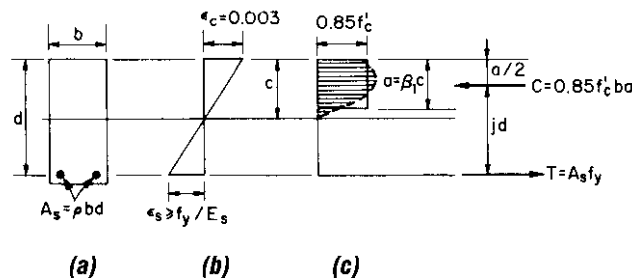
Rectangular concrete beam reinforced for tension only: (a) Beam cross section. (b) Linear distribution assumed for strains at ultimate load. (c) Equivalent rectangular stress block assumed for compression stresses at ultimate load.
